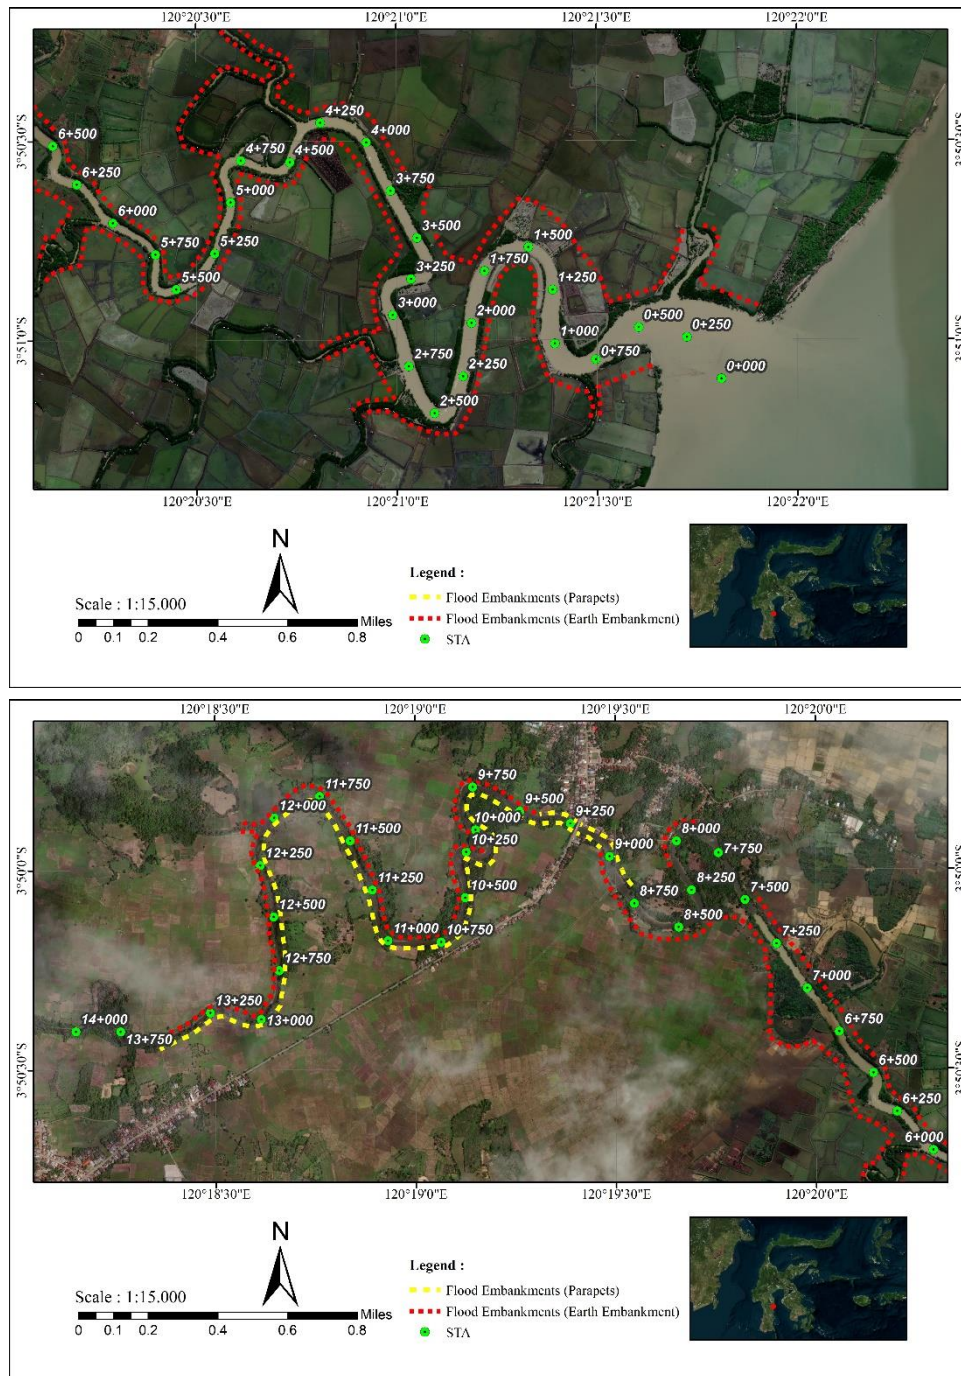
Location Layout of Flood Control and Ape River Safety Buildings
